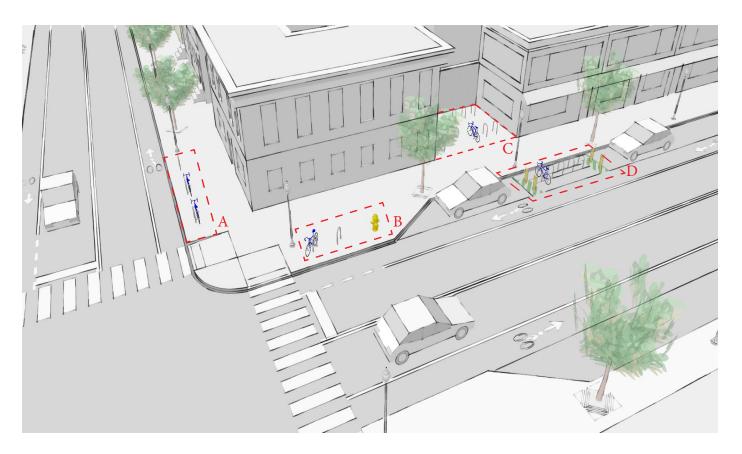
Figure B: Typical Rack Spacing: Curb/Sidewalk Section II
